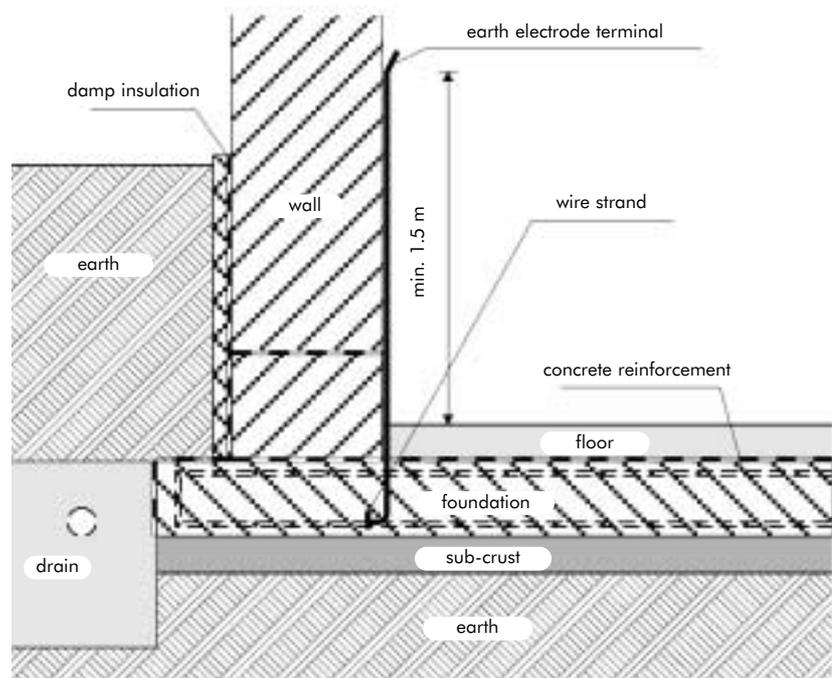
Illustration of the placement of the foundation earth electrode in a foundation with concrete reinforcement
